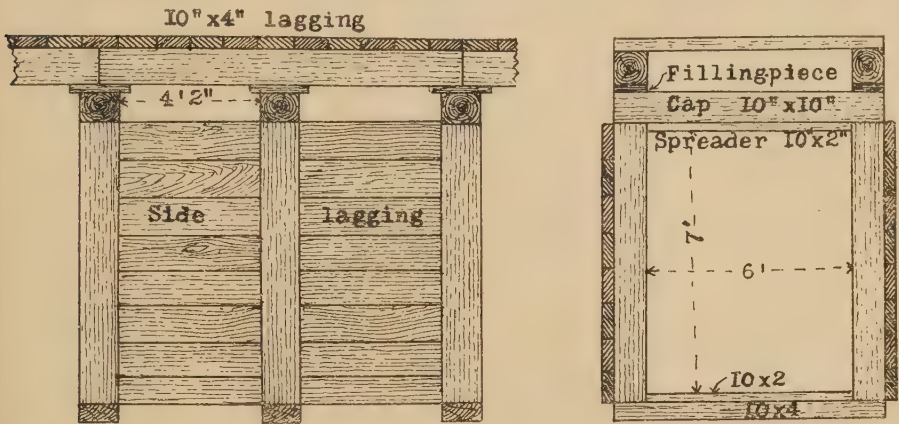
Drive-timbering, South Blocks Mine, Broken Hill, N.S.W.
